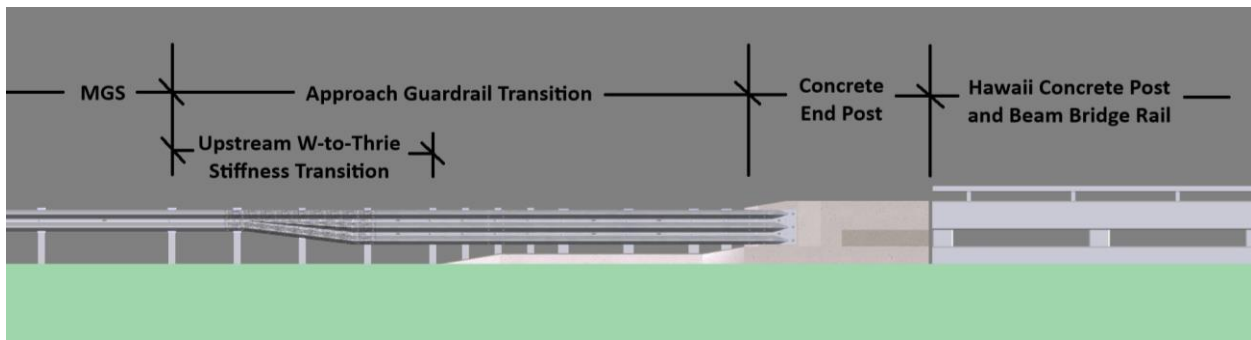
AGT from MGS to Hawaii Concrete Post and Beam Bridge Rail
